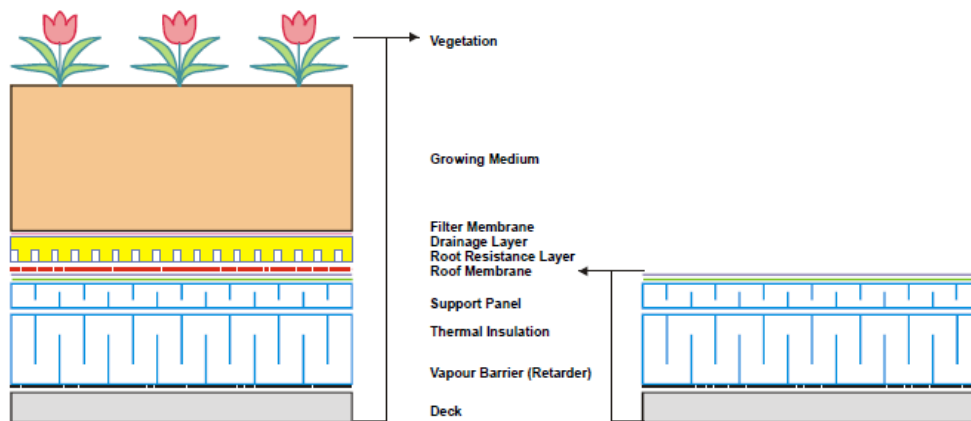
Schematic of roof designs with a garden (left) and a typical roof design without a garden (right). (Liu and Baskaran, Using Garden Roof Systems to Achieve Sustainable Building Envelopes 2005) Reprinted with permission.
